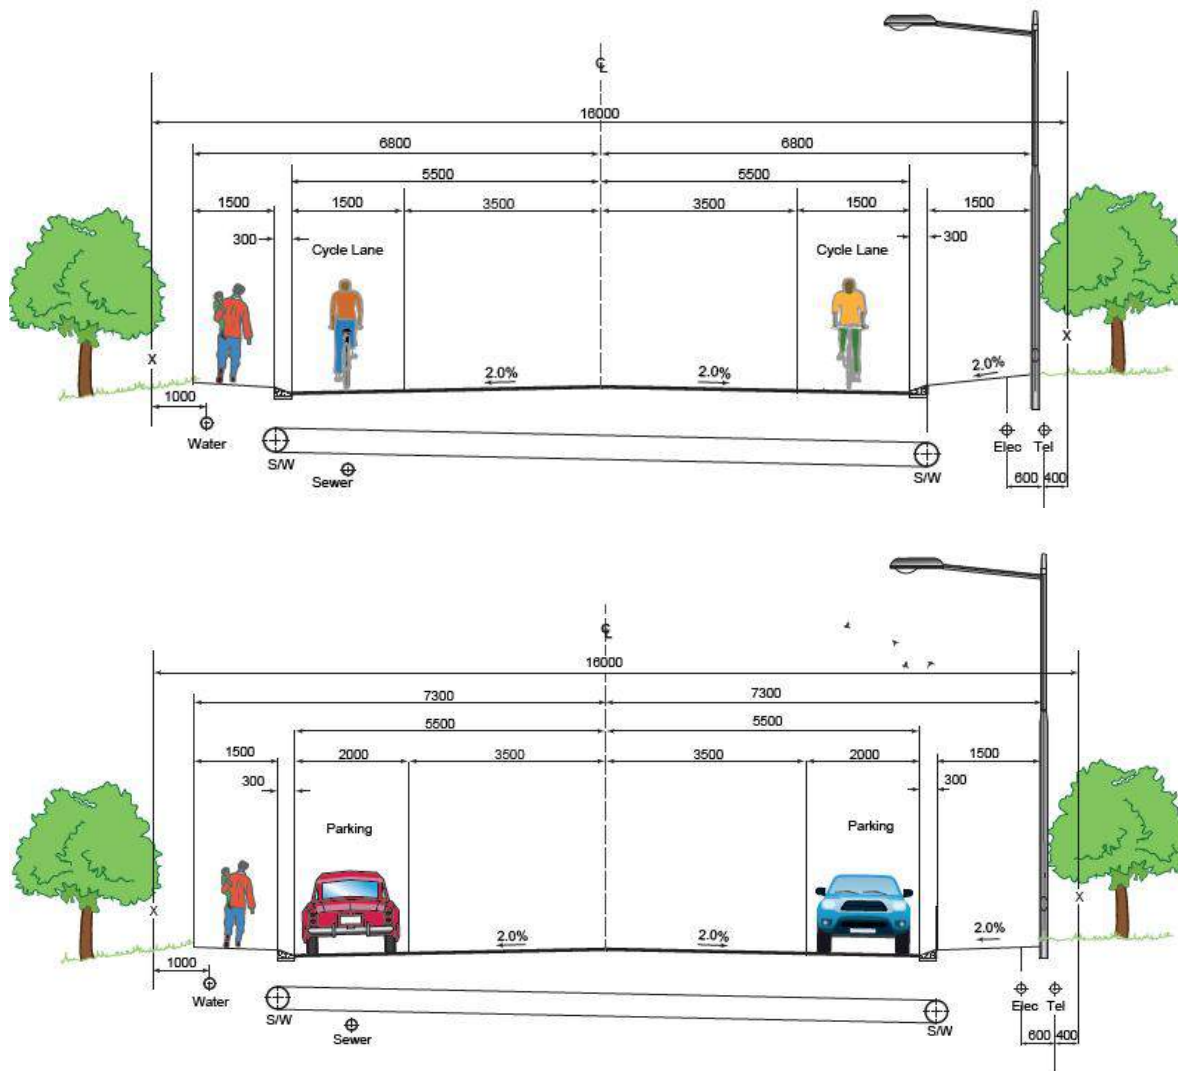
Alternative cross-section layouts on a 16 m reserve
